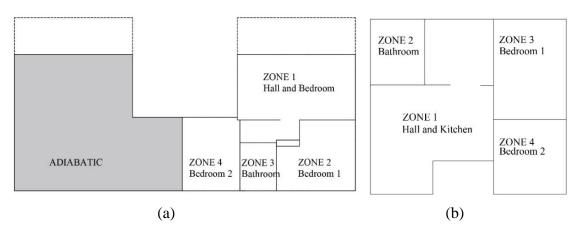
The outline plan of the case buildings in Muğla (a) and Konya (b)
